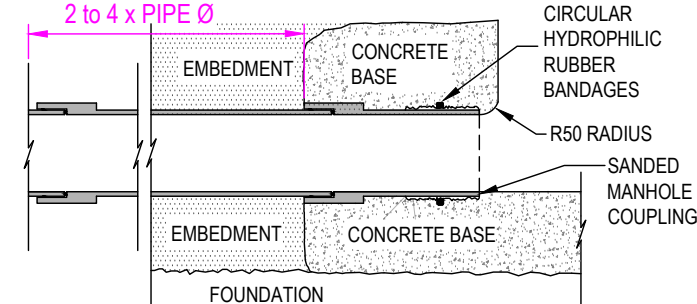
G: GRP PIPE CONNECTION (SECTION VIEW)
